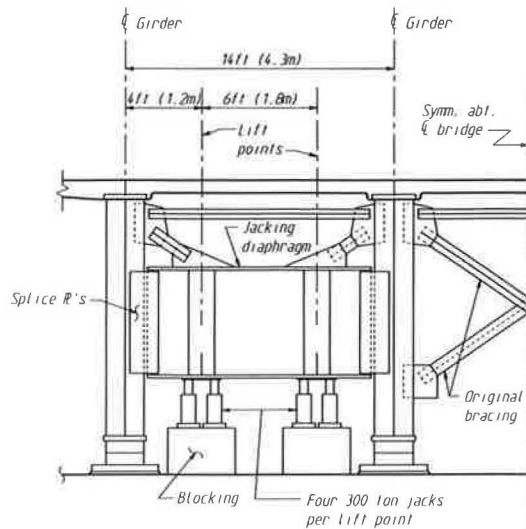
Jacking diaphragms at the intermediate pier, Pier 2.
